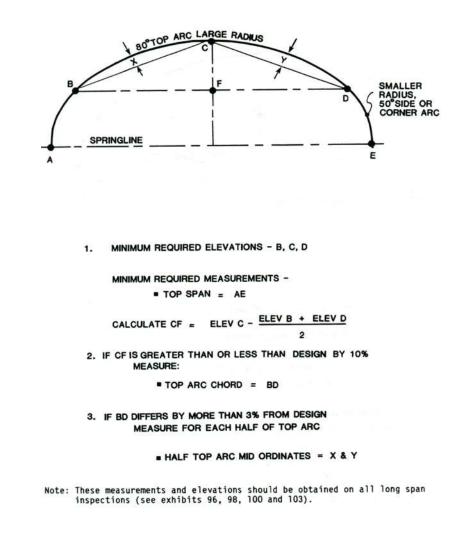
(Exhibit 95) Shape Inspection Crown Section of Long Span Structures
